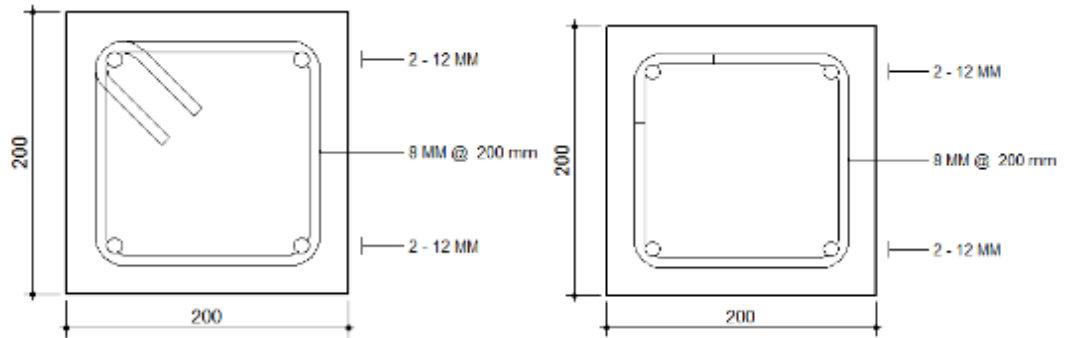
Stirrup Detailing of the specimens, 135° hook (#5 Left) and 90° hook (#4 Right)
